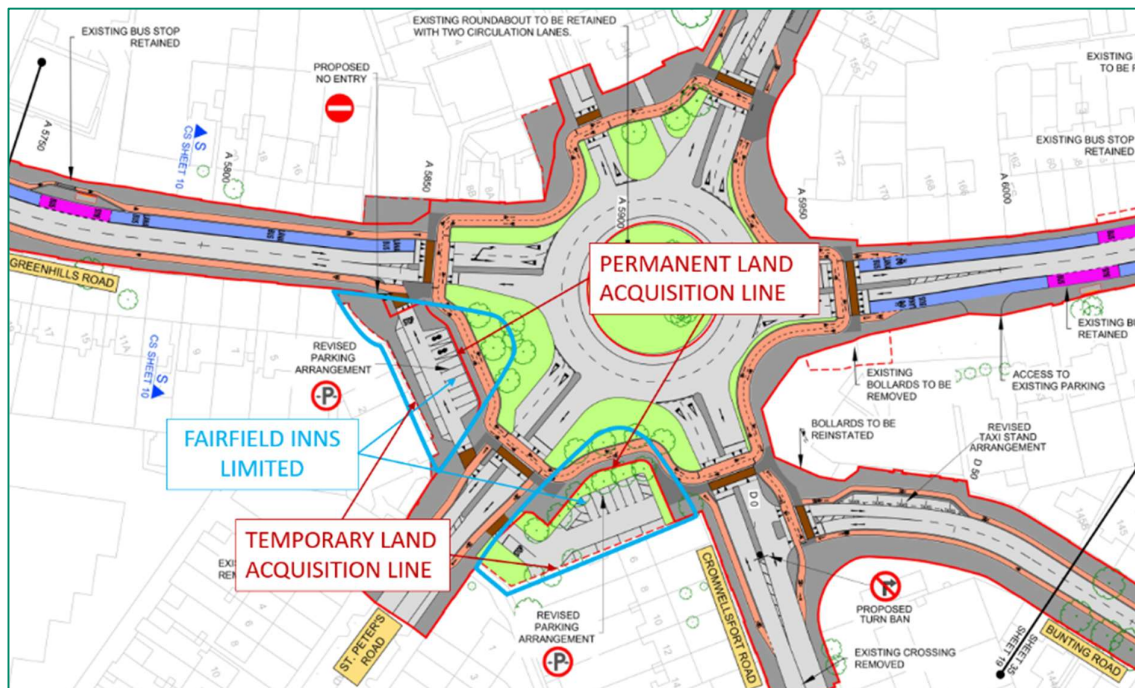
General Arrangement of Proposed Scheme at Walkinstown Roundabout (Sheet 19)
